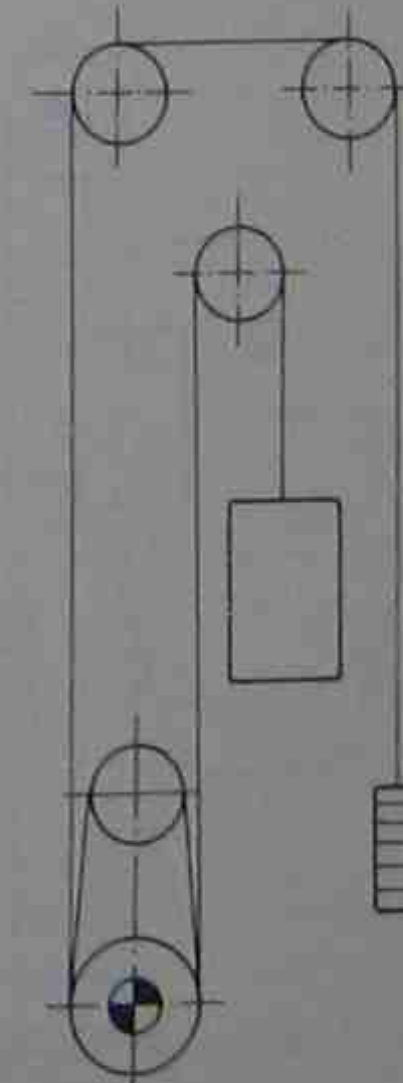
Roping system for basement position of the machine, double wrap drive, roping factor 1.
